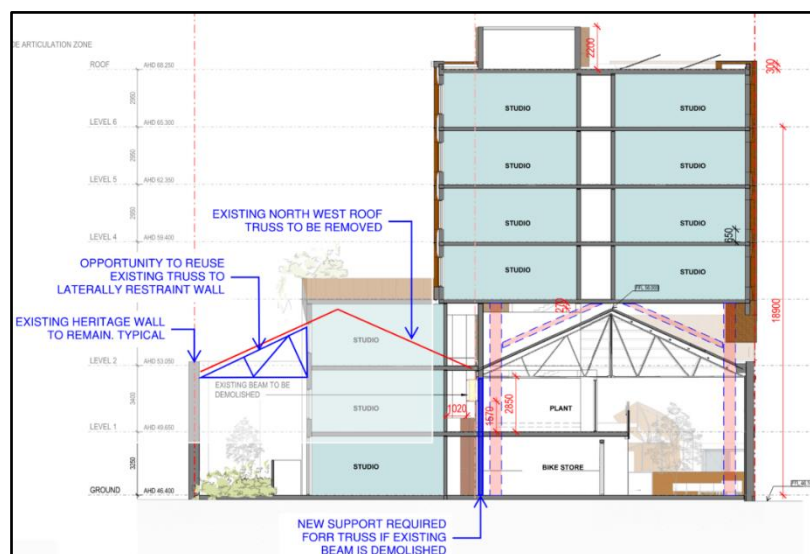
Building section at the west of building - extract from 2732_Brunswick Road_Town Planning Package
